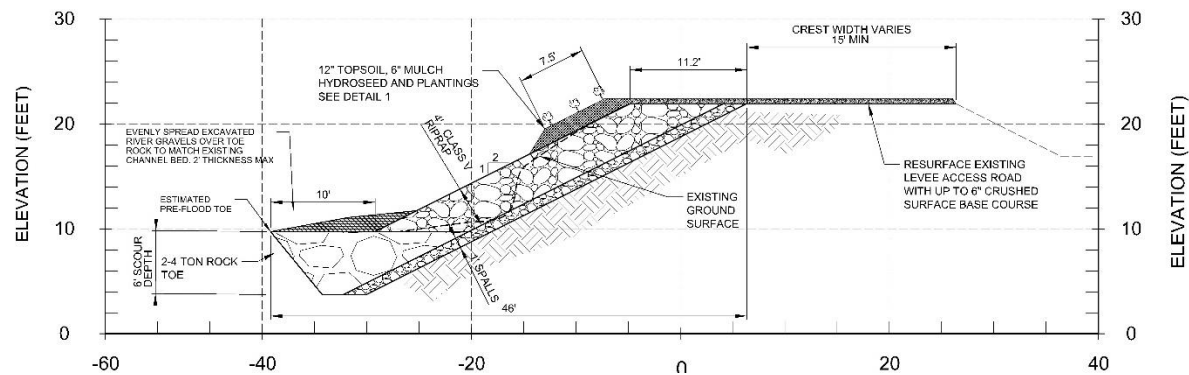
Typical cross section for the proposed repairs under the preferred alternative.
